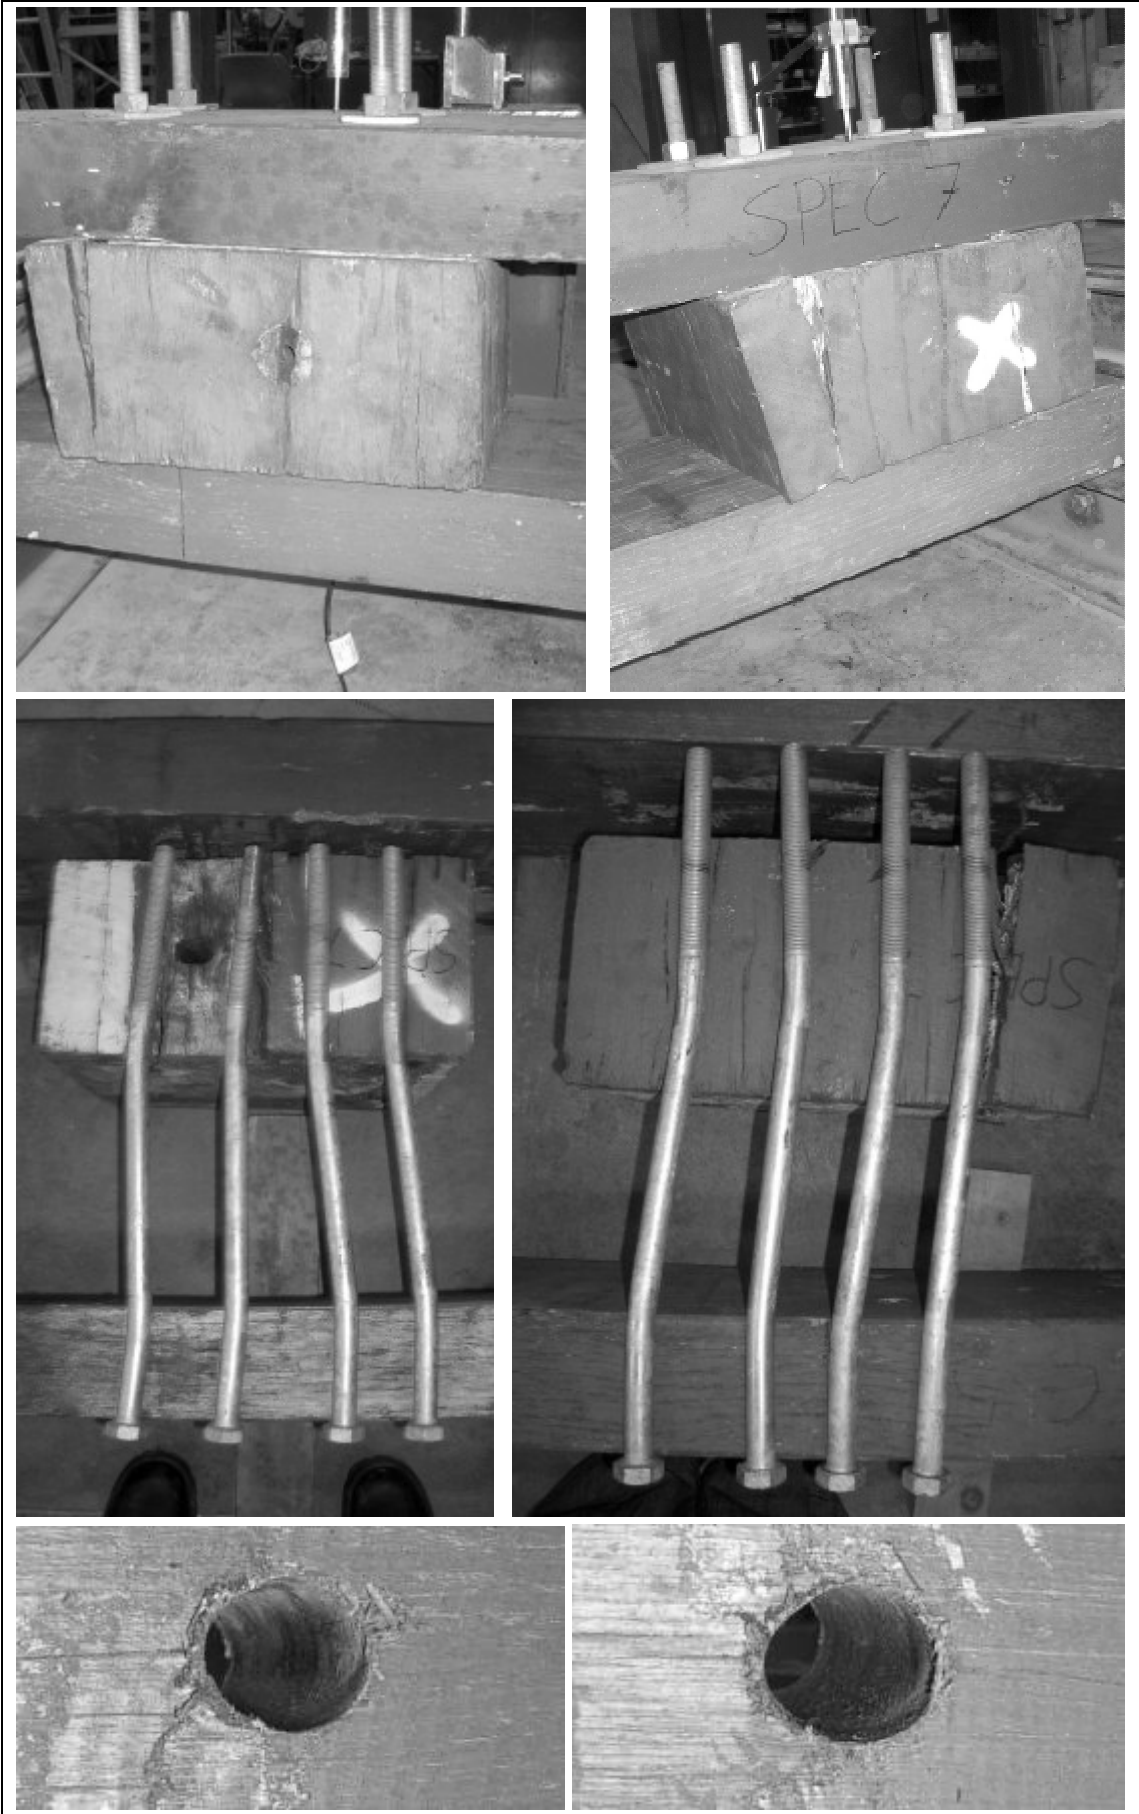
Photographs of spacers, bolts and bolt holes in flitches for Assembly 05-07
